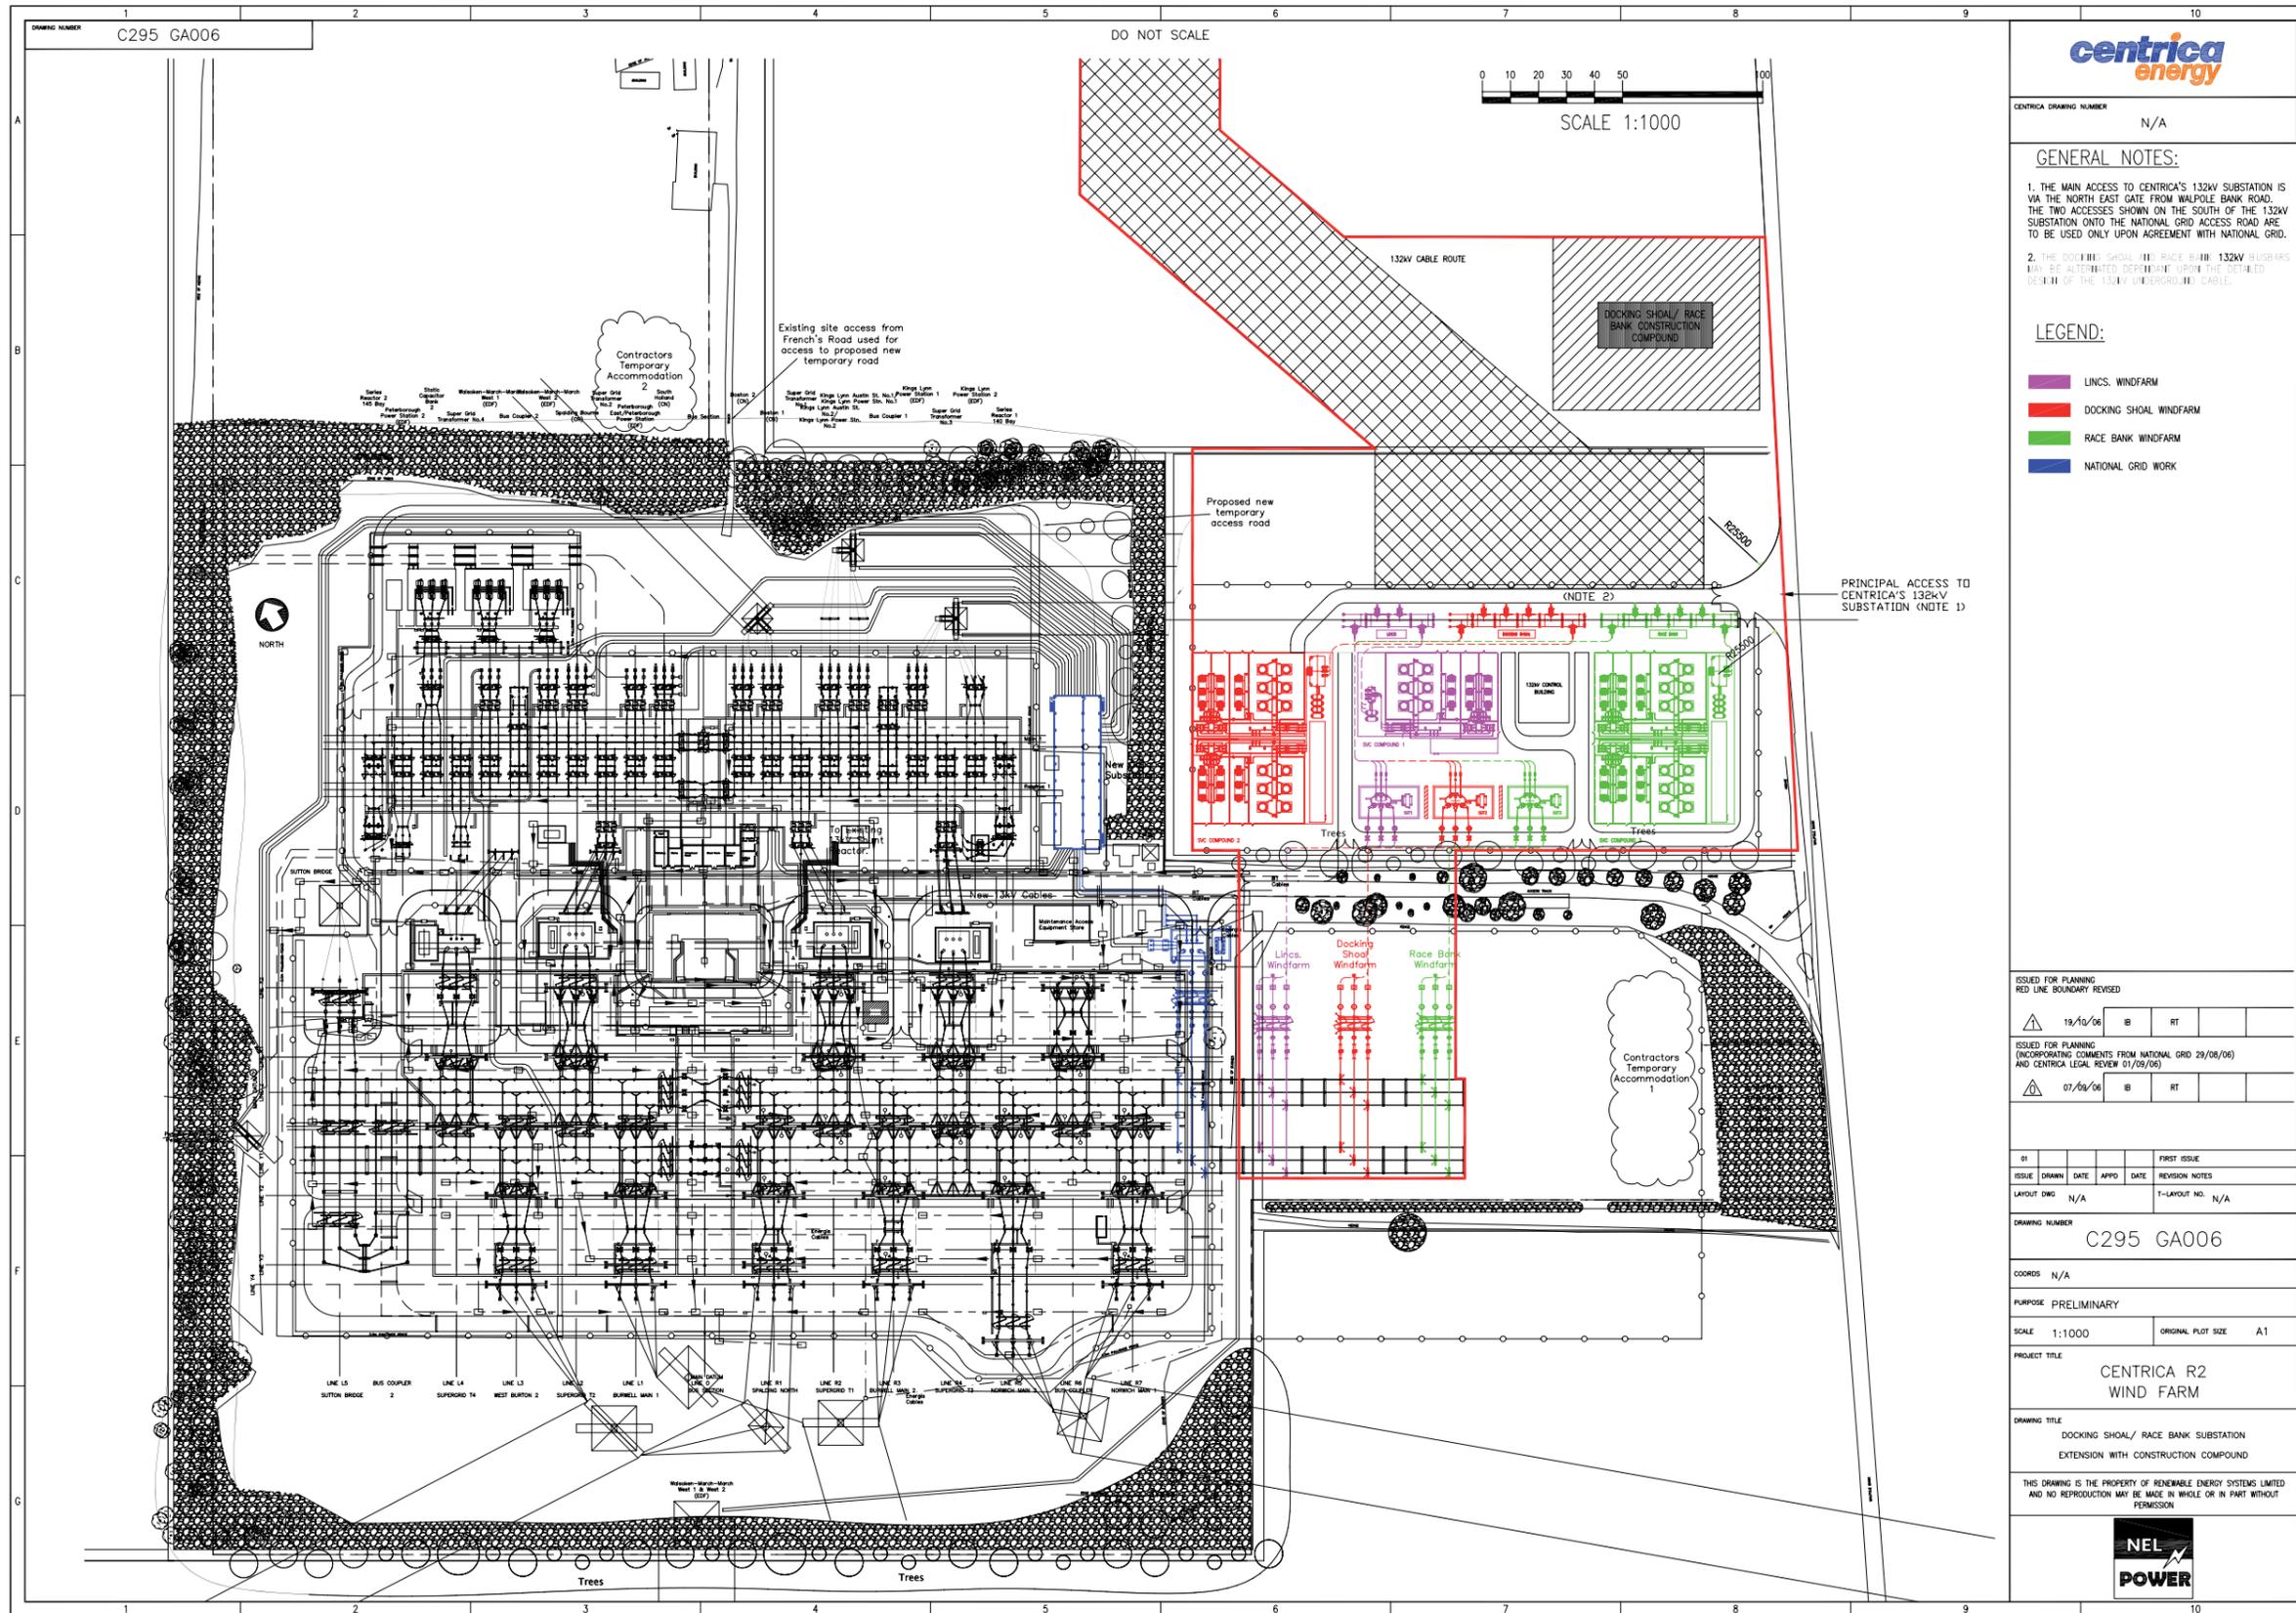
| Location of Docking Shoal and Race Bank construction compound
